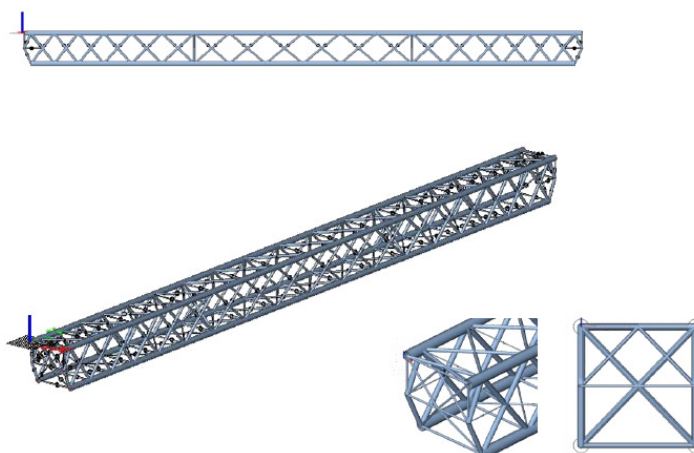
BRIDGE GIRDER LAYOUT FROM YIP (2015)
